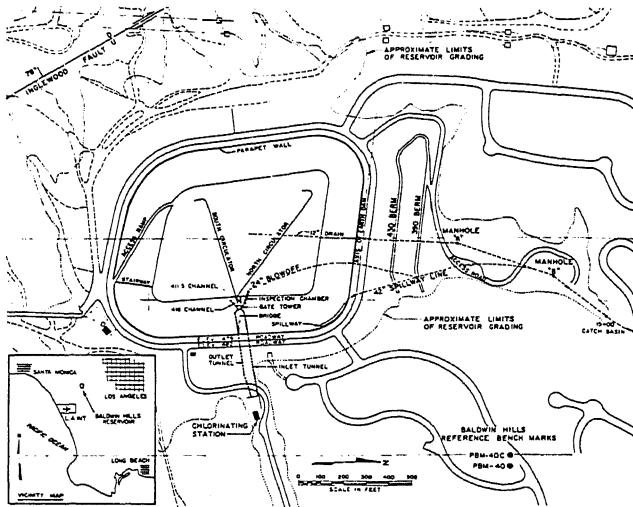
Location and General Site Plan of Baldwin Hills Reservoir
